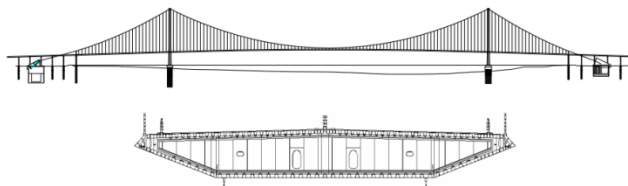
Outline of Nanjing Yangtze 4th Bridge
